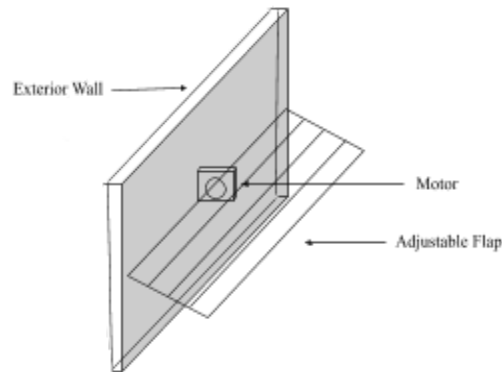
Close-up of Adjustable Flap System. Shows the motor, which would rotate to adjust the flap. Both the motor and flap would be attached to the exterior wall, which an incision made in the flap to allow the motor to pass through. This system would be replicated for all six flaps.
